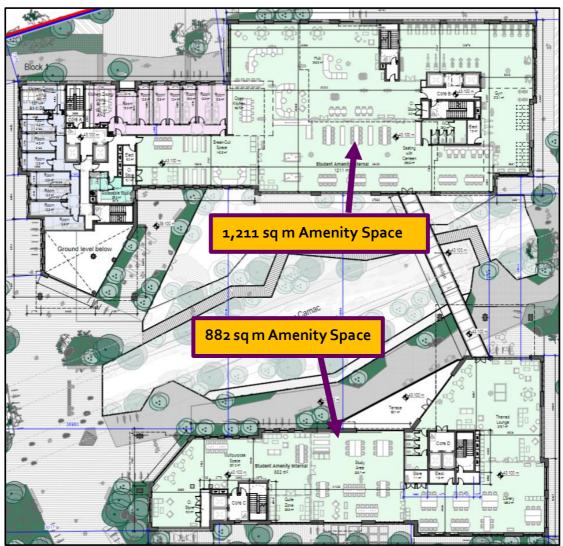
Location of Amenity Space on First Floor Level in Block 1 and 2
